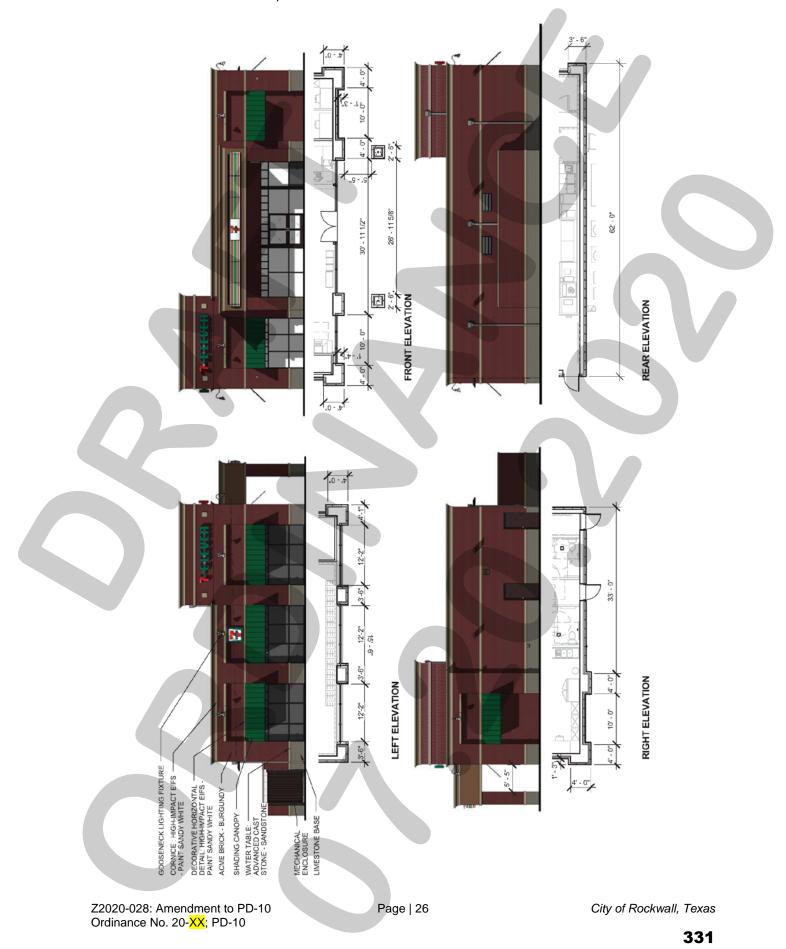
EXHIBIT 'G': Concept Plan and Elevations from Ordinance No. 12-13
